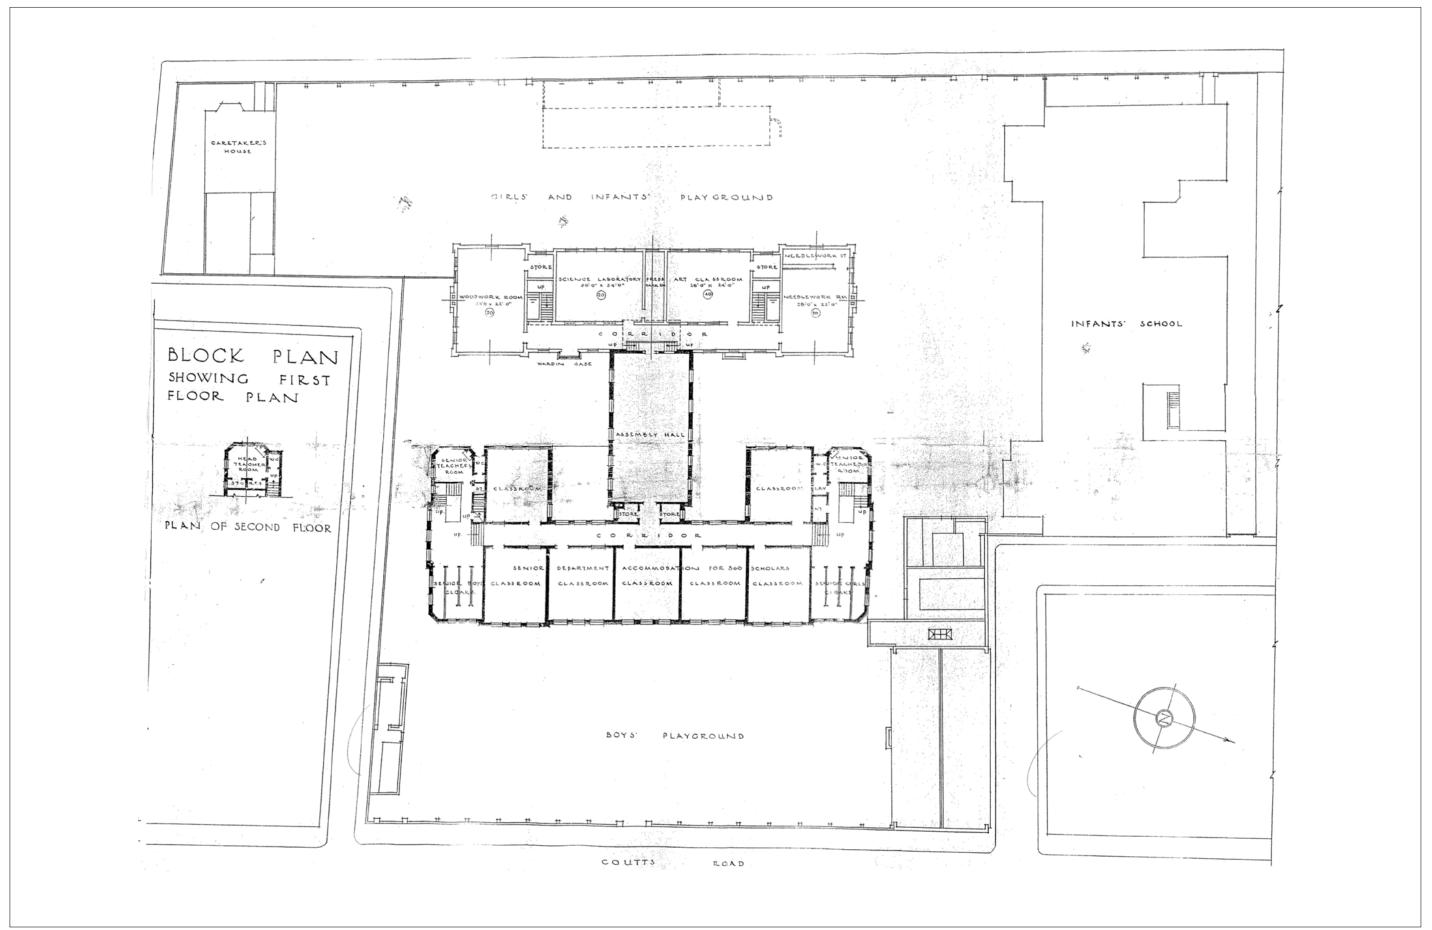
Block Plan showing First Floor Plan. Walker Gate School, Alterations and Additions Drawing No. 6/2. November 1935, Newcastle-upon-Tyne Education Committee Original scale: 16 feet to 1 inch
